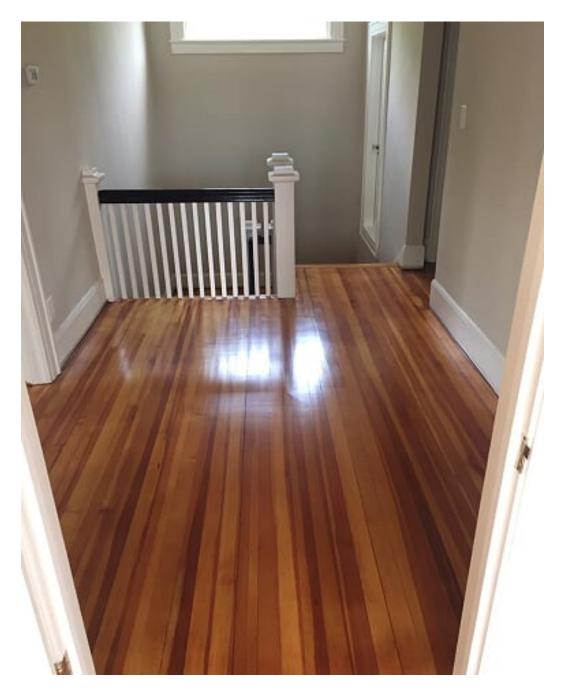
Photograph of Floor of the Master Bedroom Upstairs
